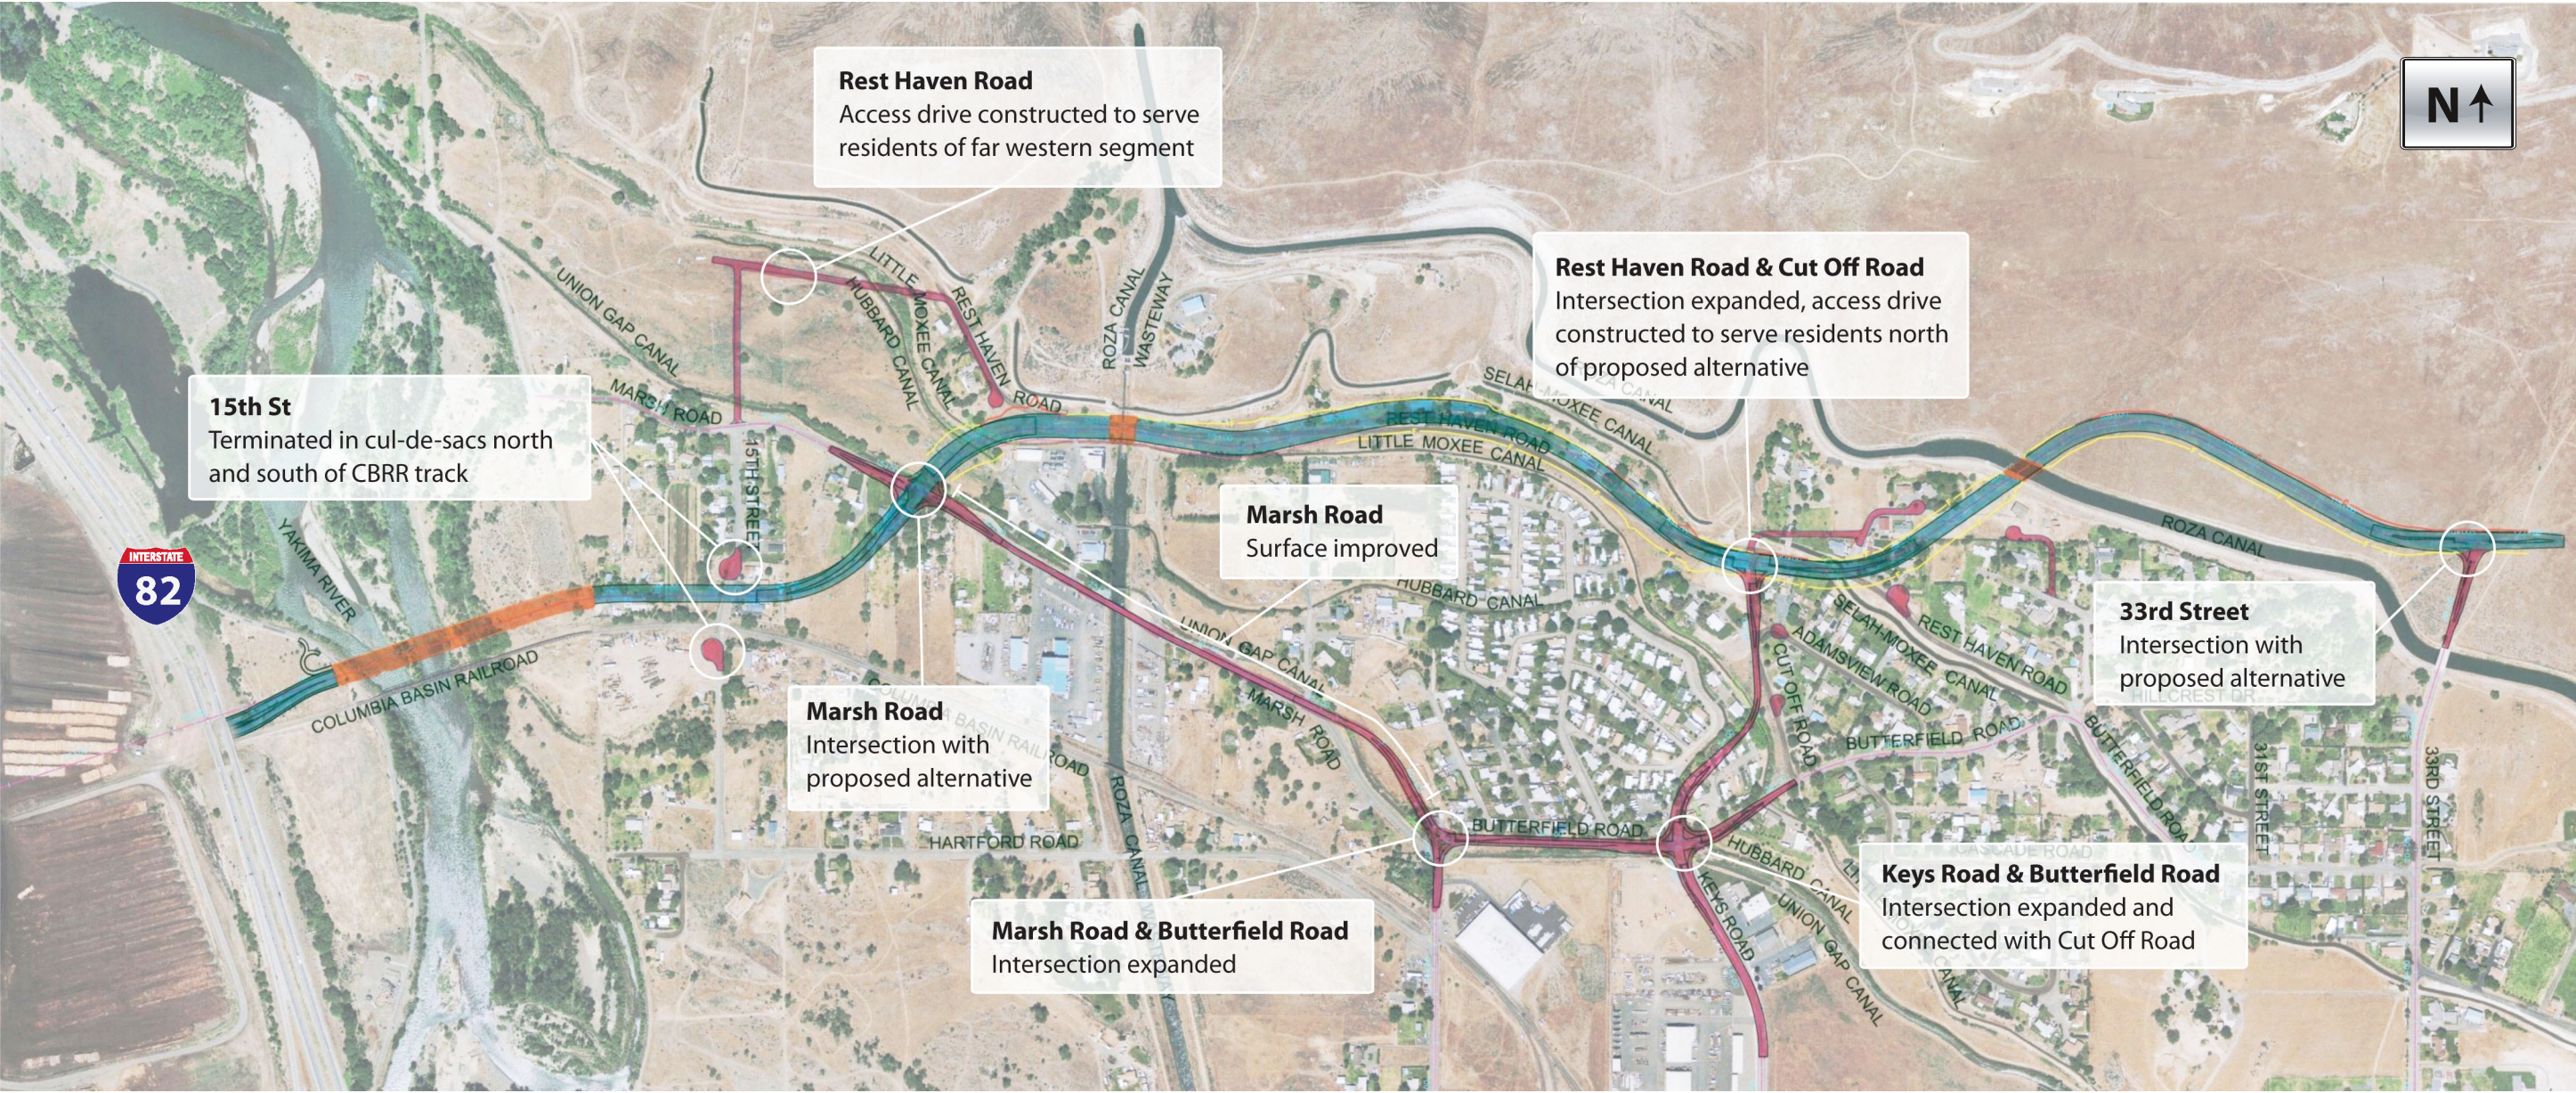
Alignment Alternative 3 – Ridge Base – Suggested Improvements to Existing Roadway Network
